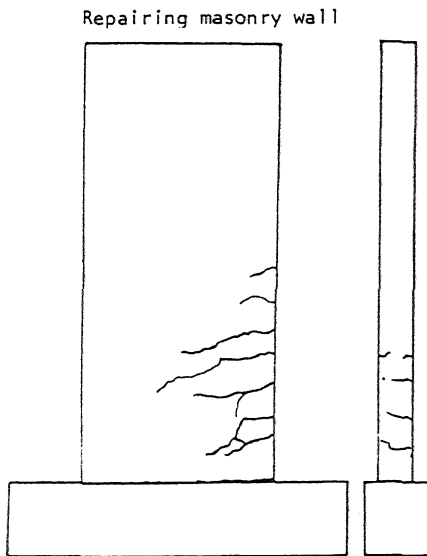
State of damage of original and repairing masonry wall (Technique N°1).
